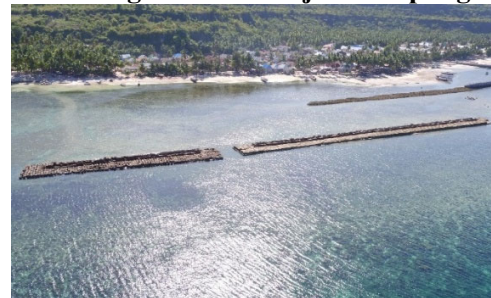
Concrete Beach Embankment Pantai Wameo, Kabupaten Bau-Bau, PUPR
